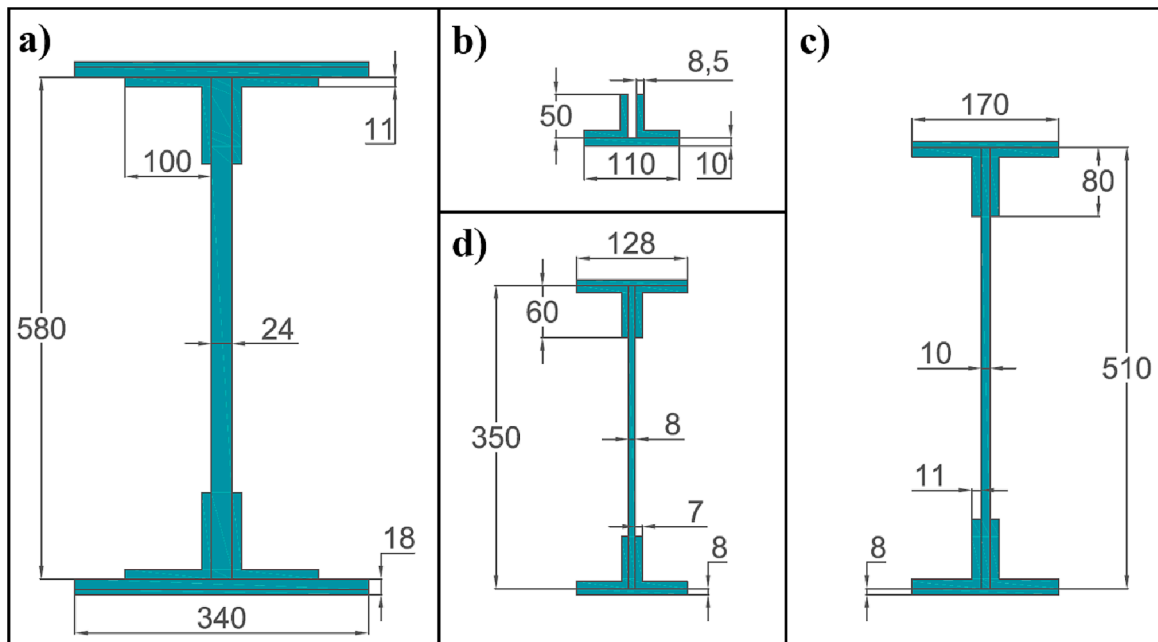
Cross-section shape and dimensions of steel members: a) arch ribs and tie girders b) vertical hangers c) cross-girders d) stringers.
